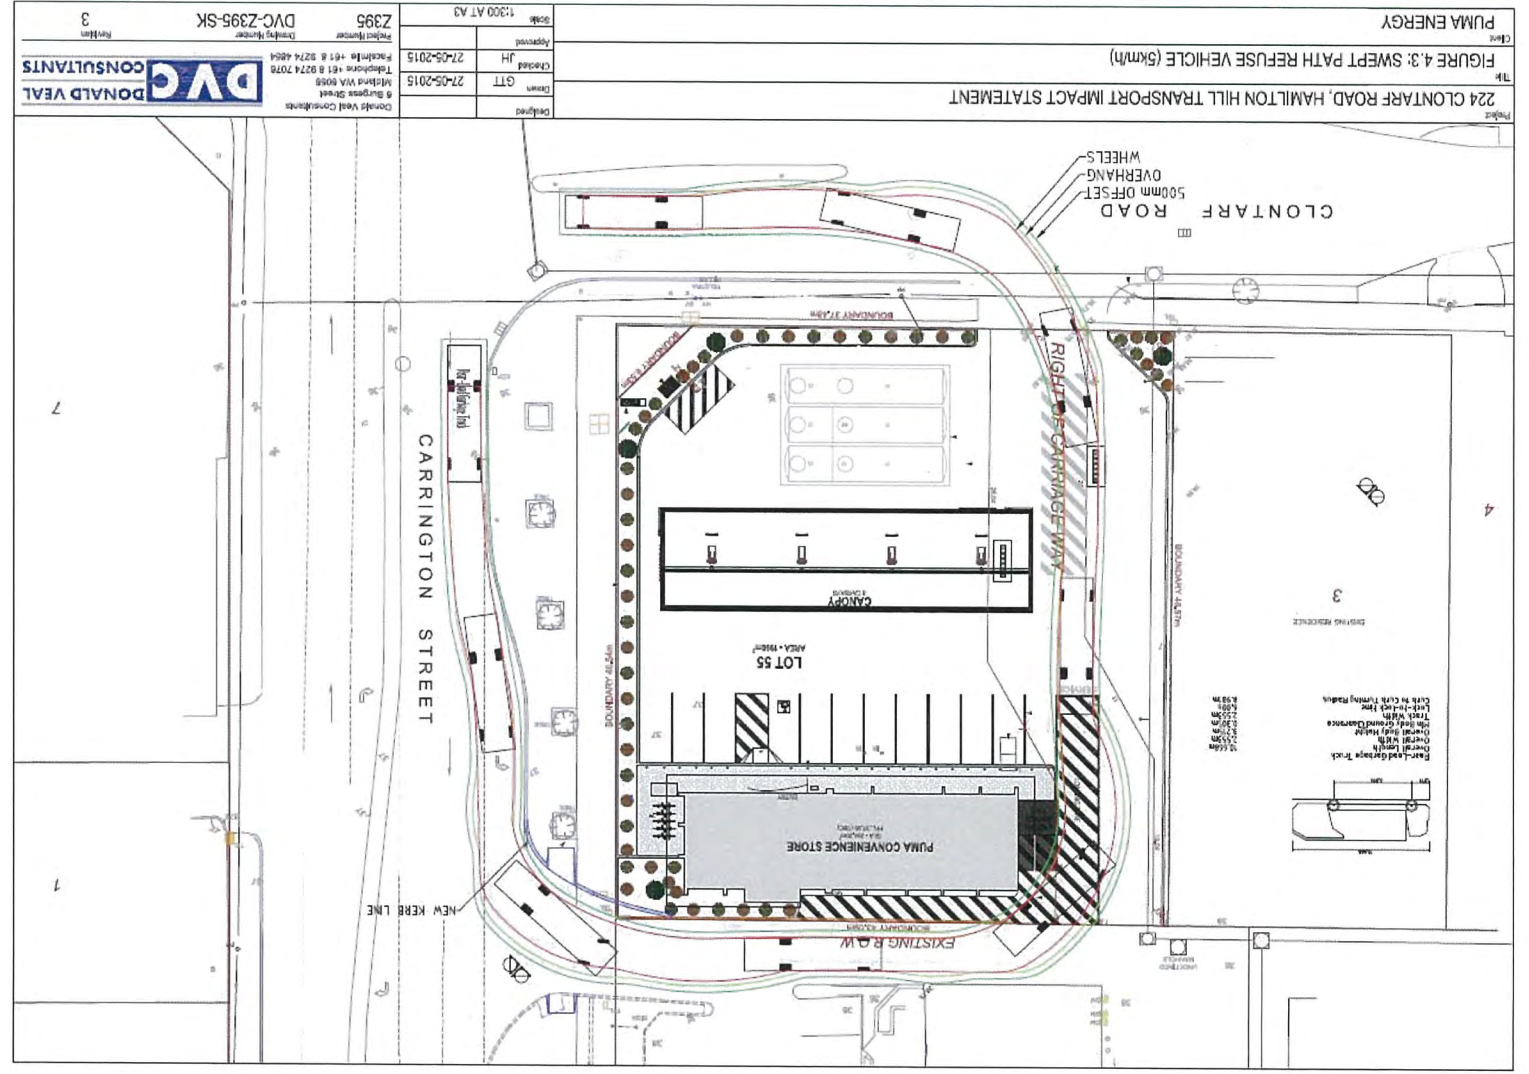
Swept path of refuse vehicle entering Clontarf Road and exiting Carrington Street
